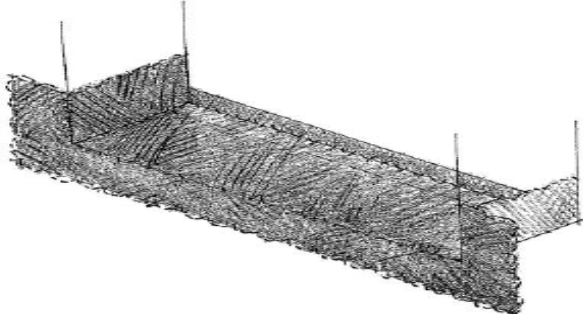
Configurations of Typical Sill Pan Flashing—Isometric
